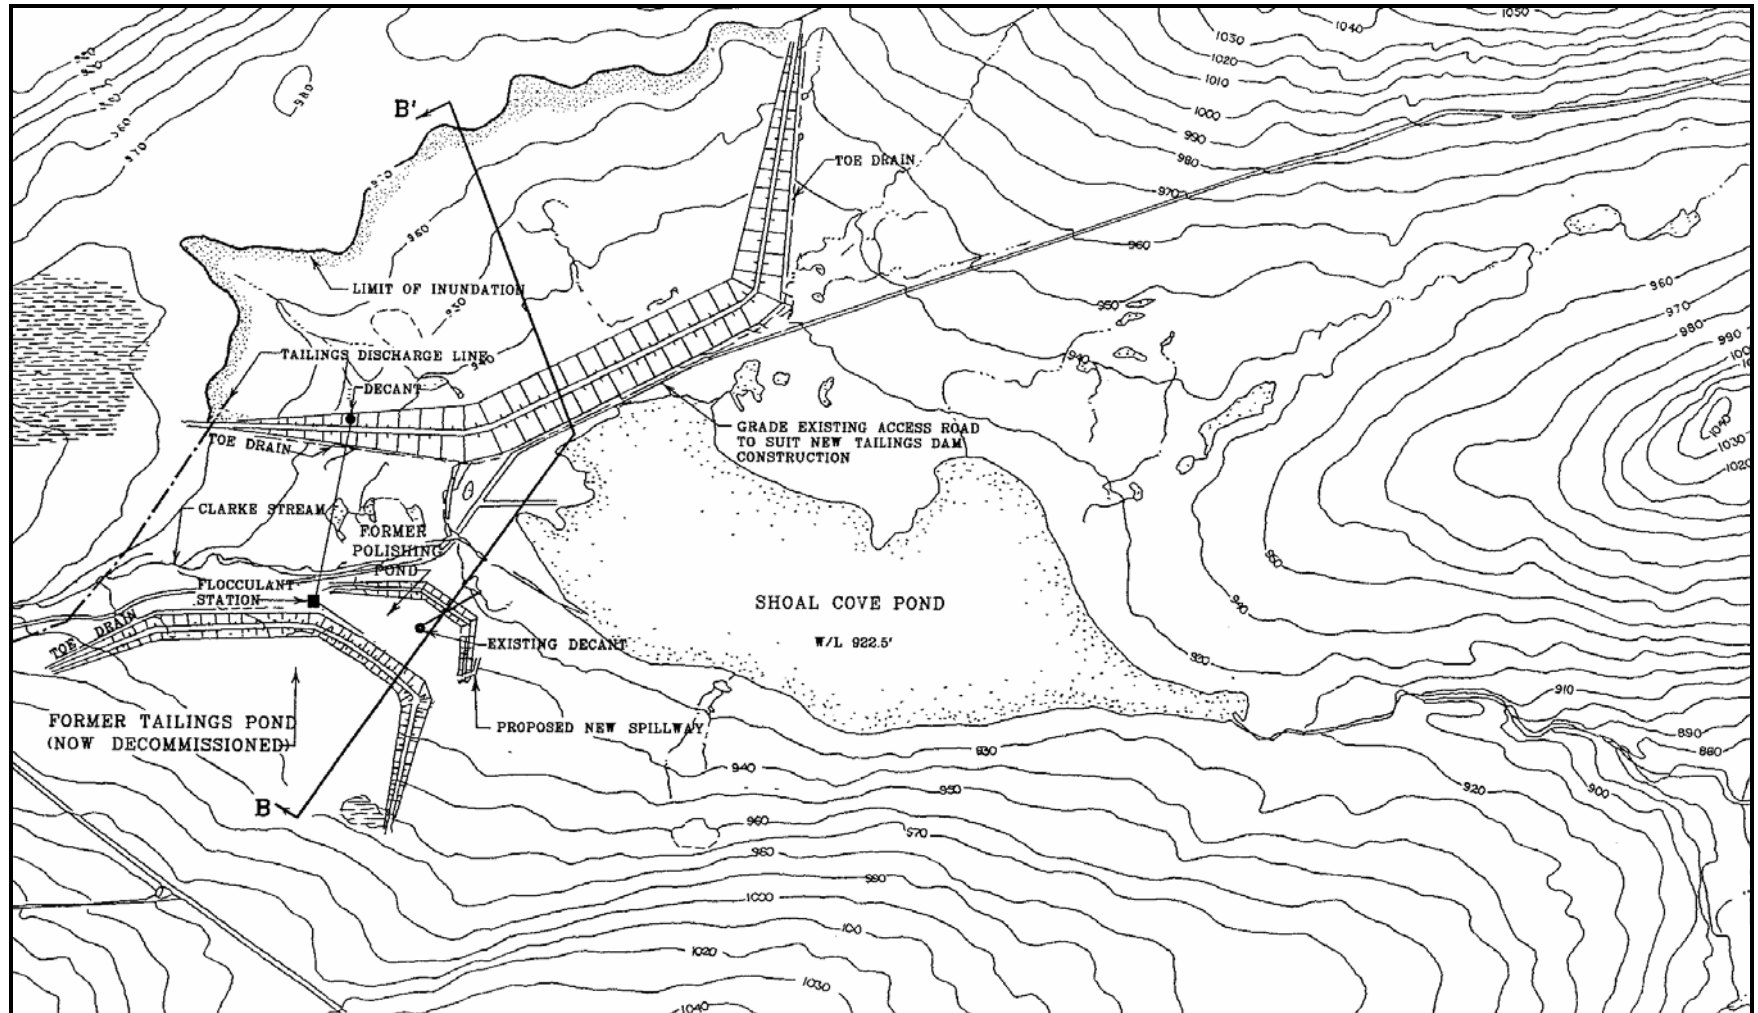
Hillside Tailings Disposal Alternative (northeast end of Shoal Cove Pond)
